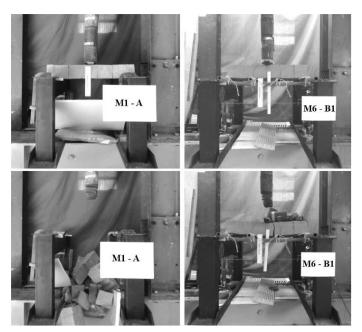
Comparison between the unreinforced wall (M1) and the wall reinforced with bamboo frame (M6-B1).
